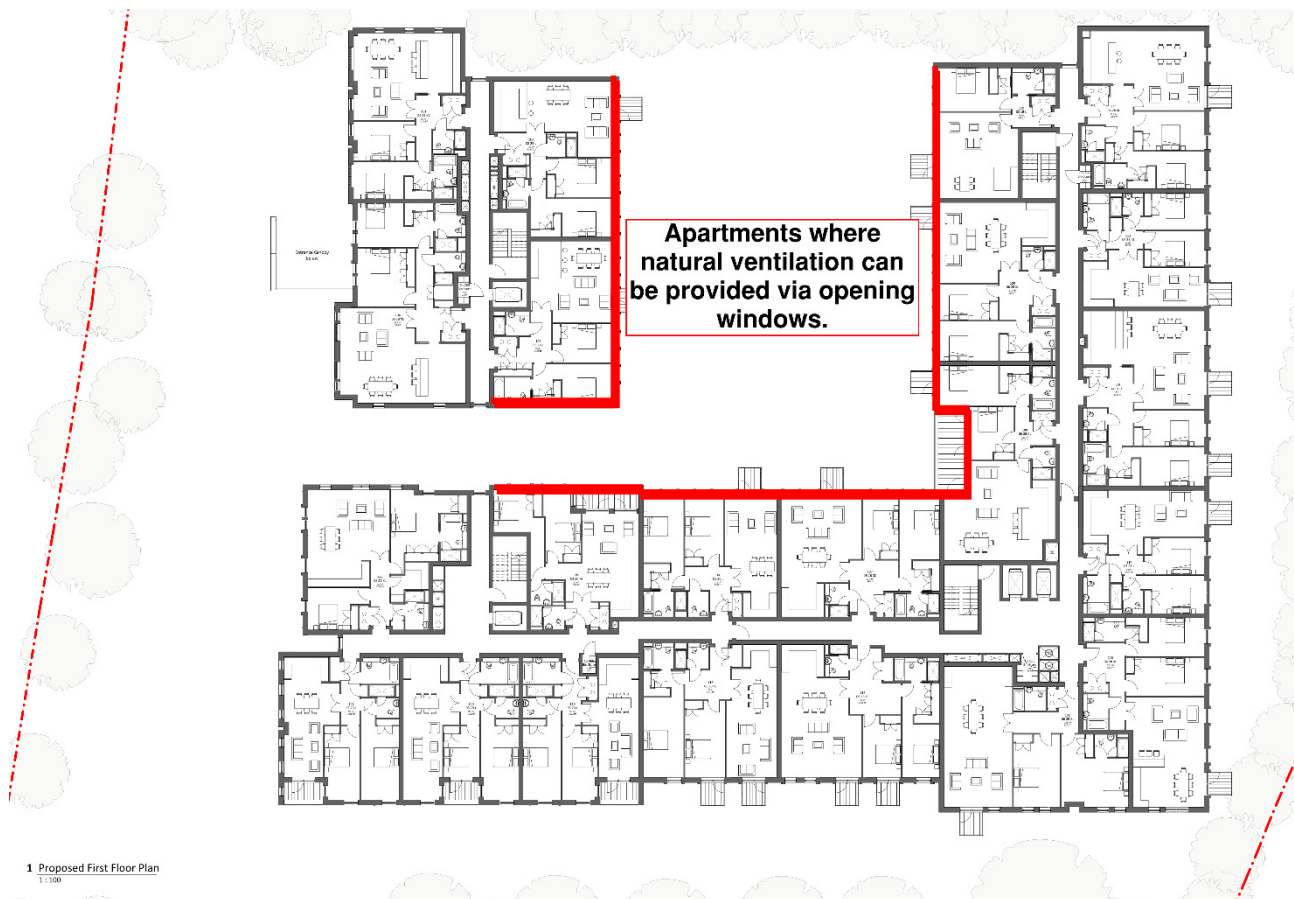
Apartments where Natural Ventilation can be provided via Opening Windows
